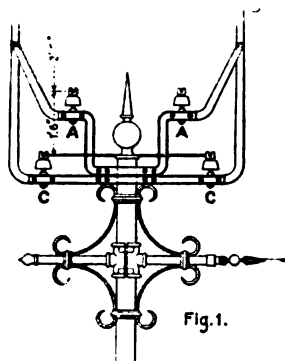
MR. REGINALD WILSON'S DESIGN AT DUDLEY, 1906. THE PARTS A B C MAY BE REMOVED.
